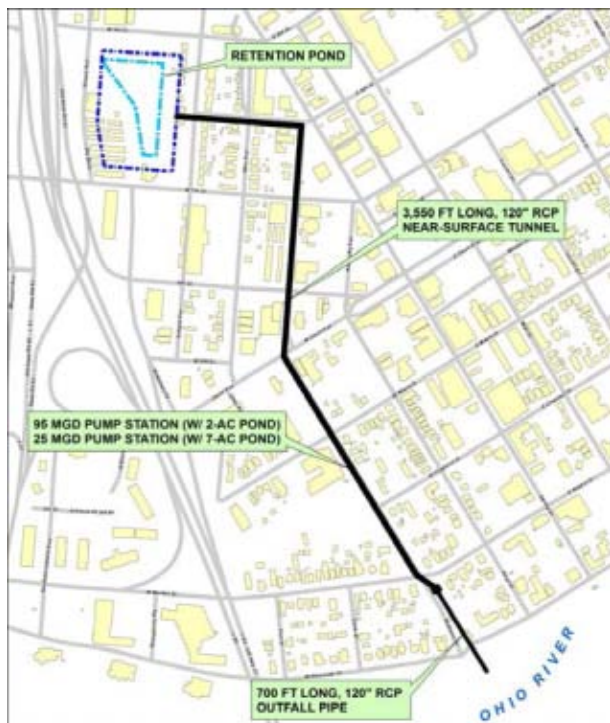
General Layout of Near-Surface Tunnel Alternative
